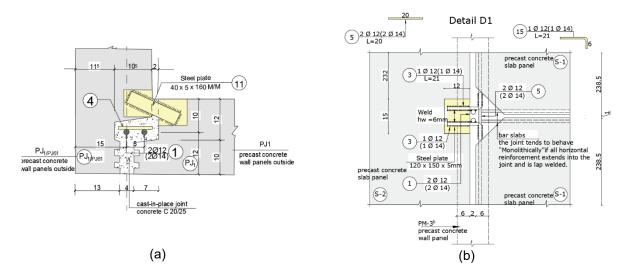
Connections between adjacent panels in LPBs: (a) connection VJ1 between vertical panels and (b) connection between the horizontal slab panels (source: AQTN,1999).
